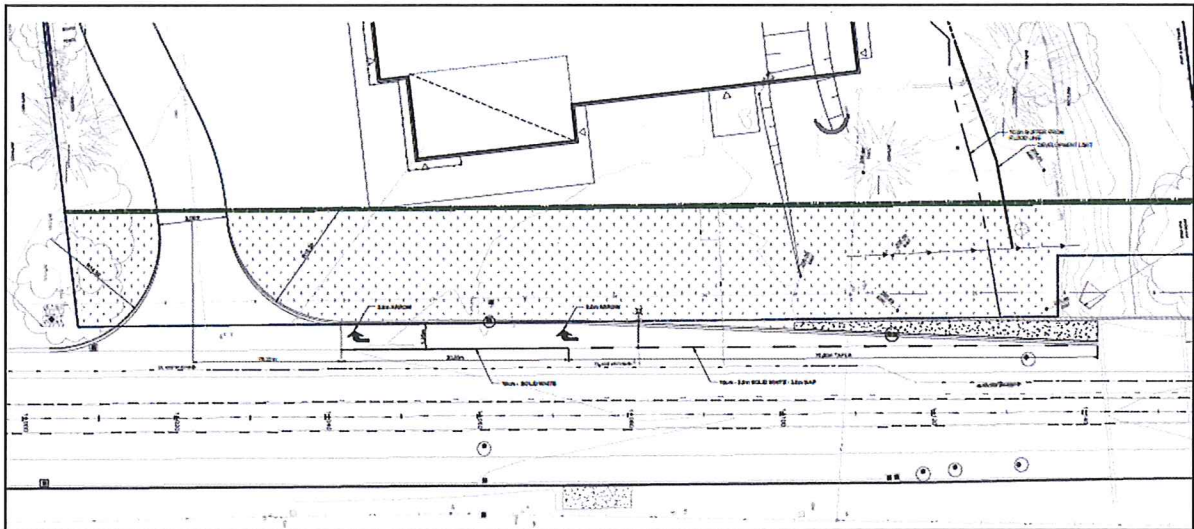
8175 Winston Churchill Boulevard Pavement Marking and Signage Plan
